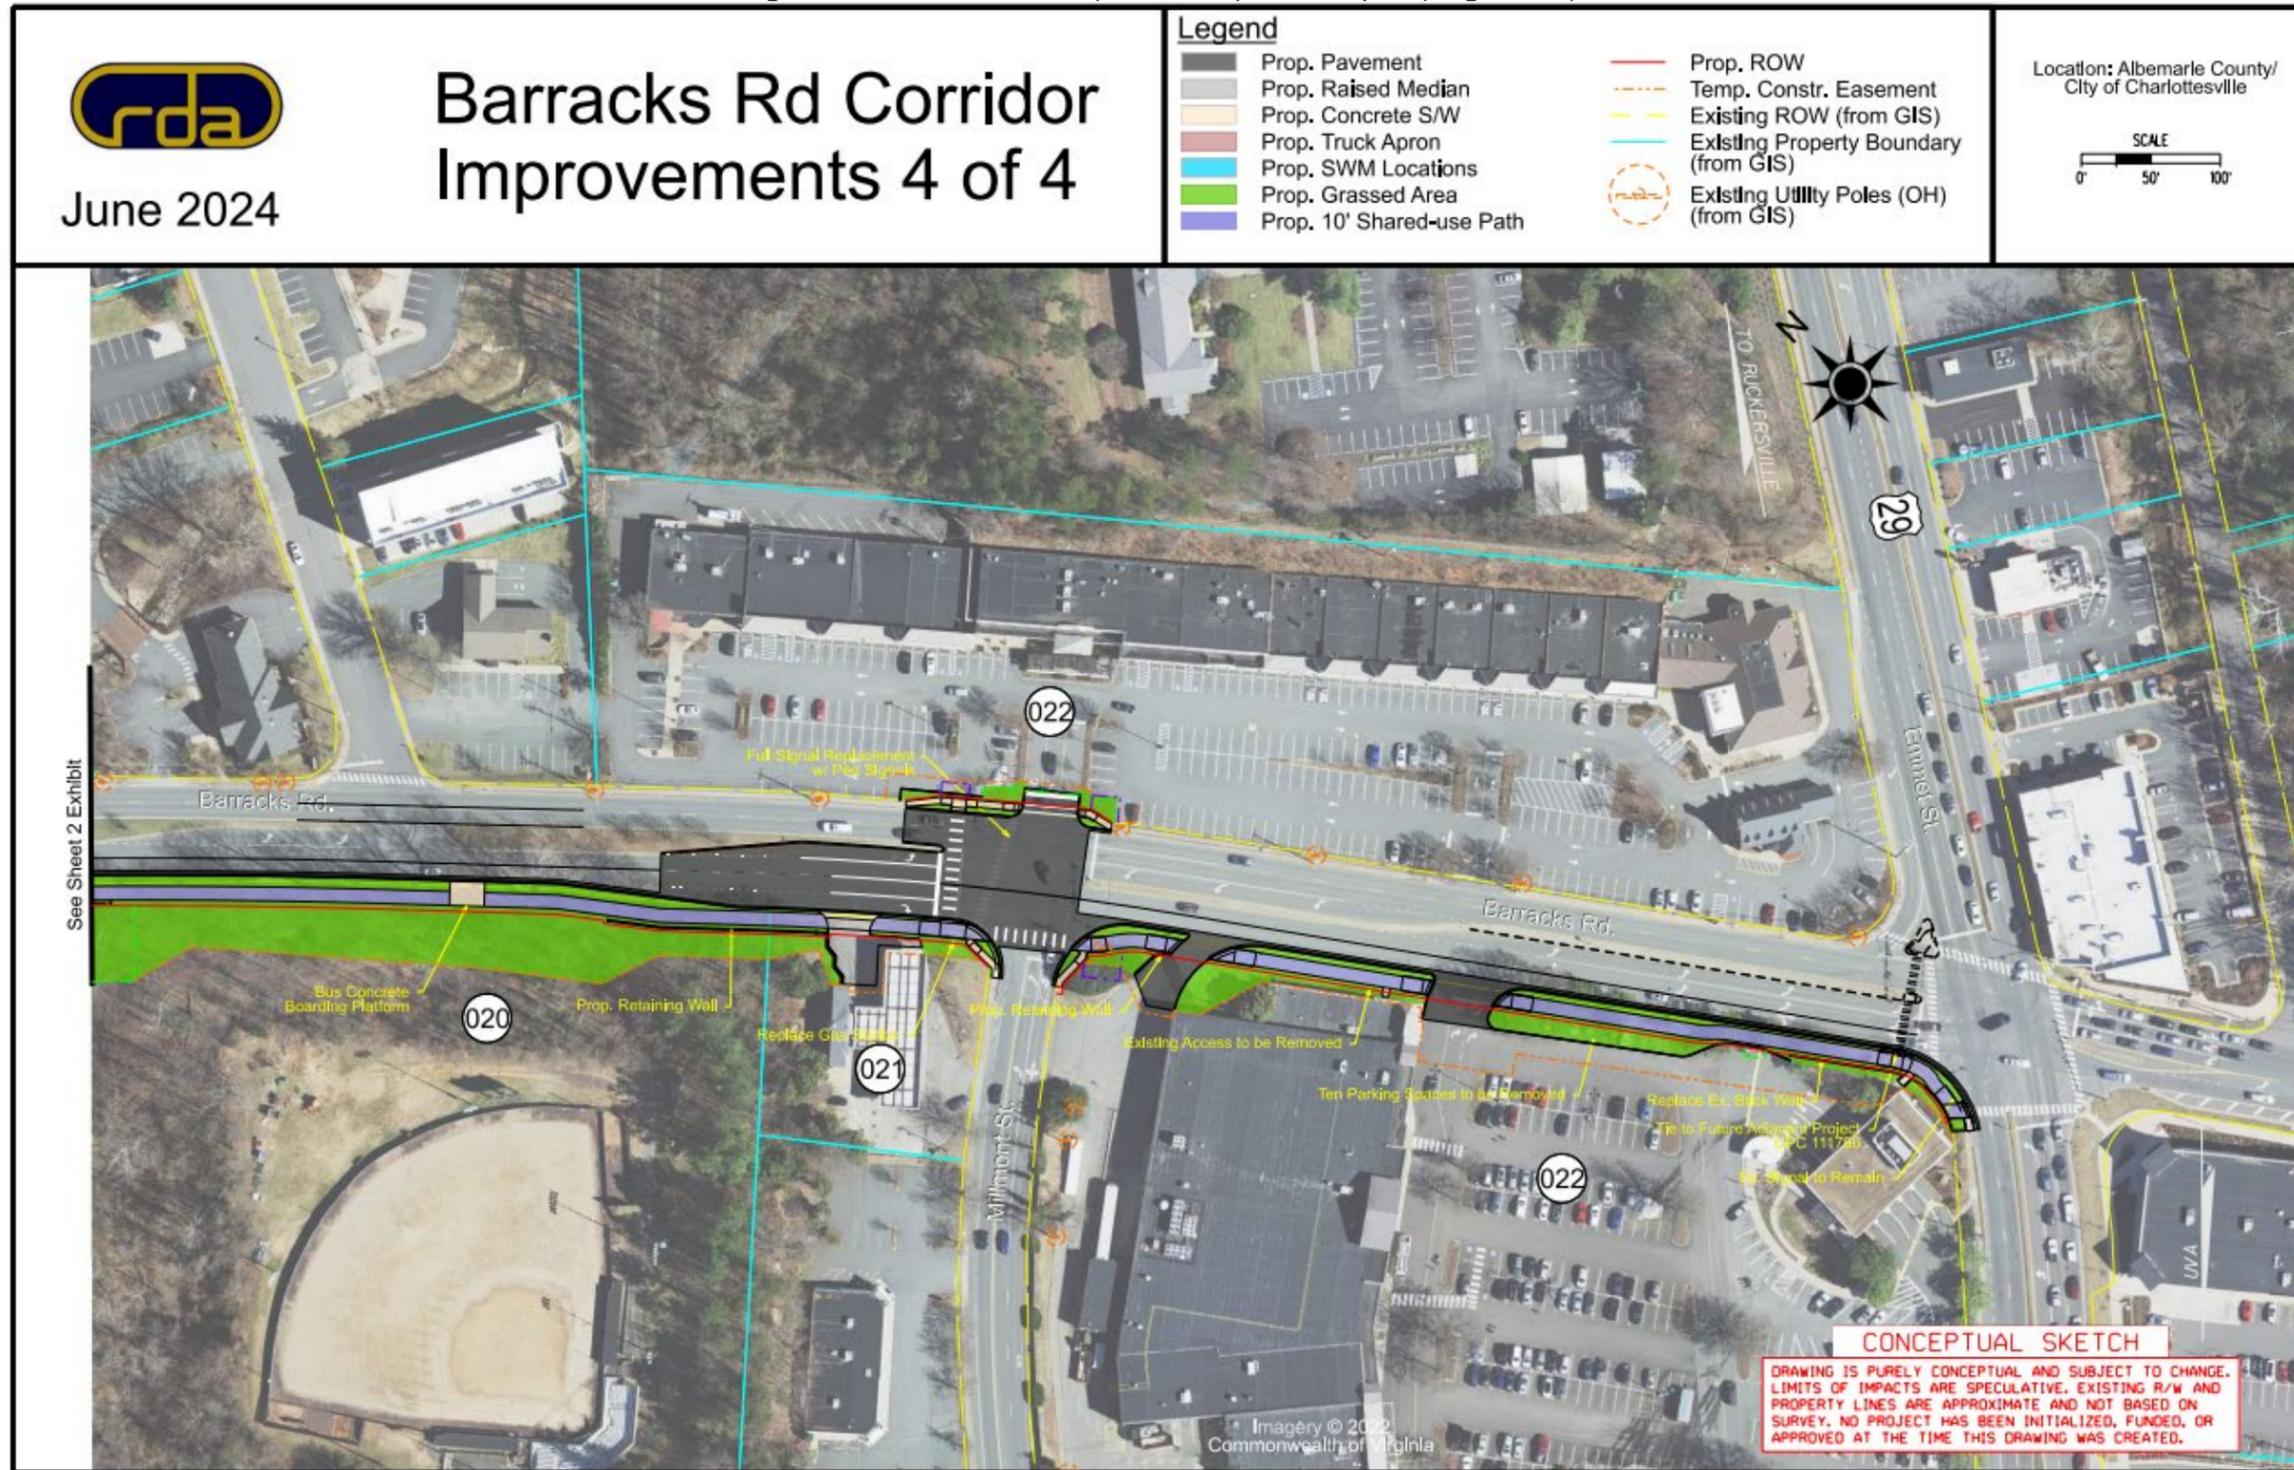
Barracks Road (Route 654) – Layout for Concept 8
